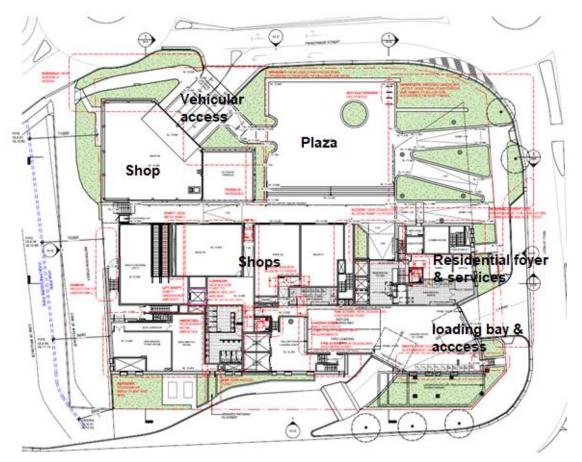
Proposed amended Ground Floor Plan showing the site layout.
